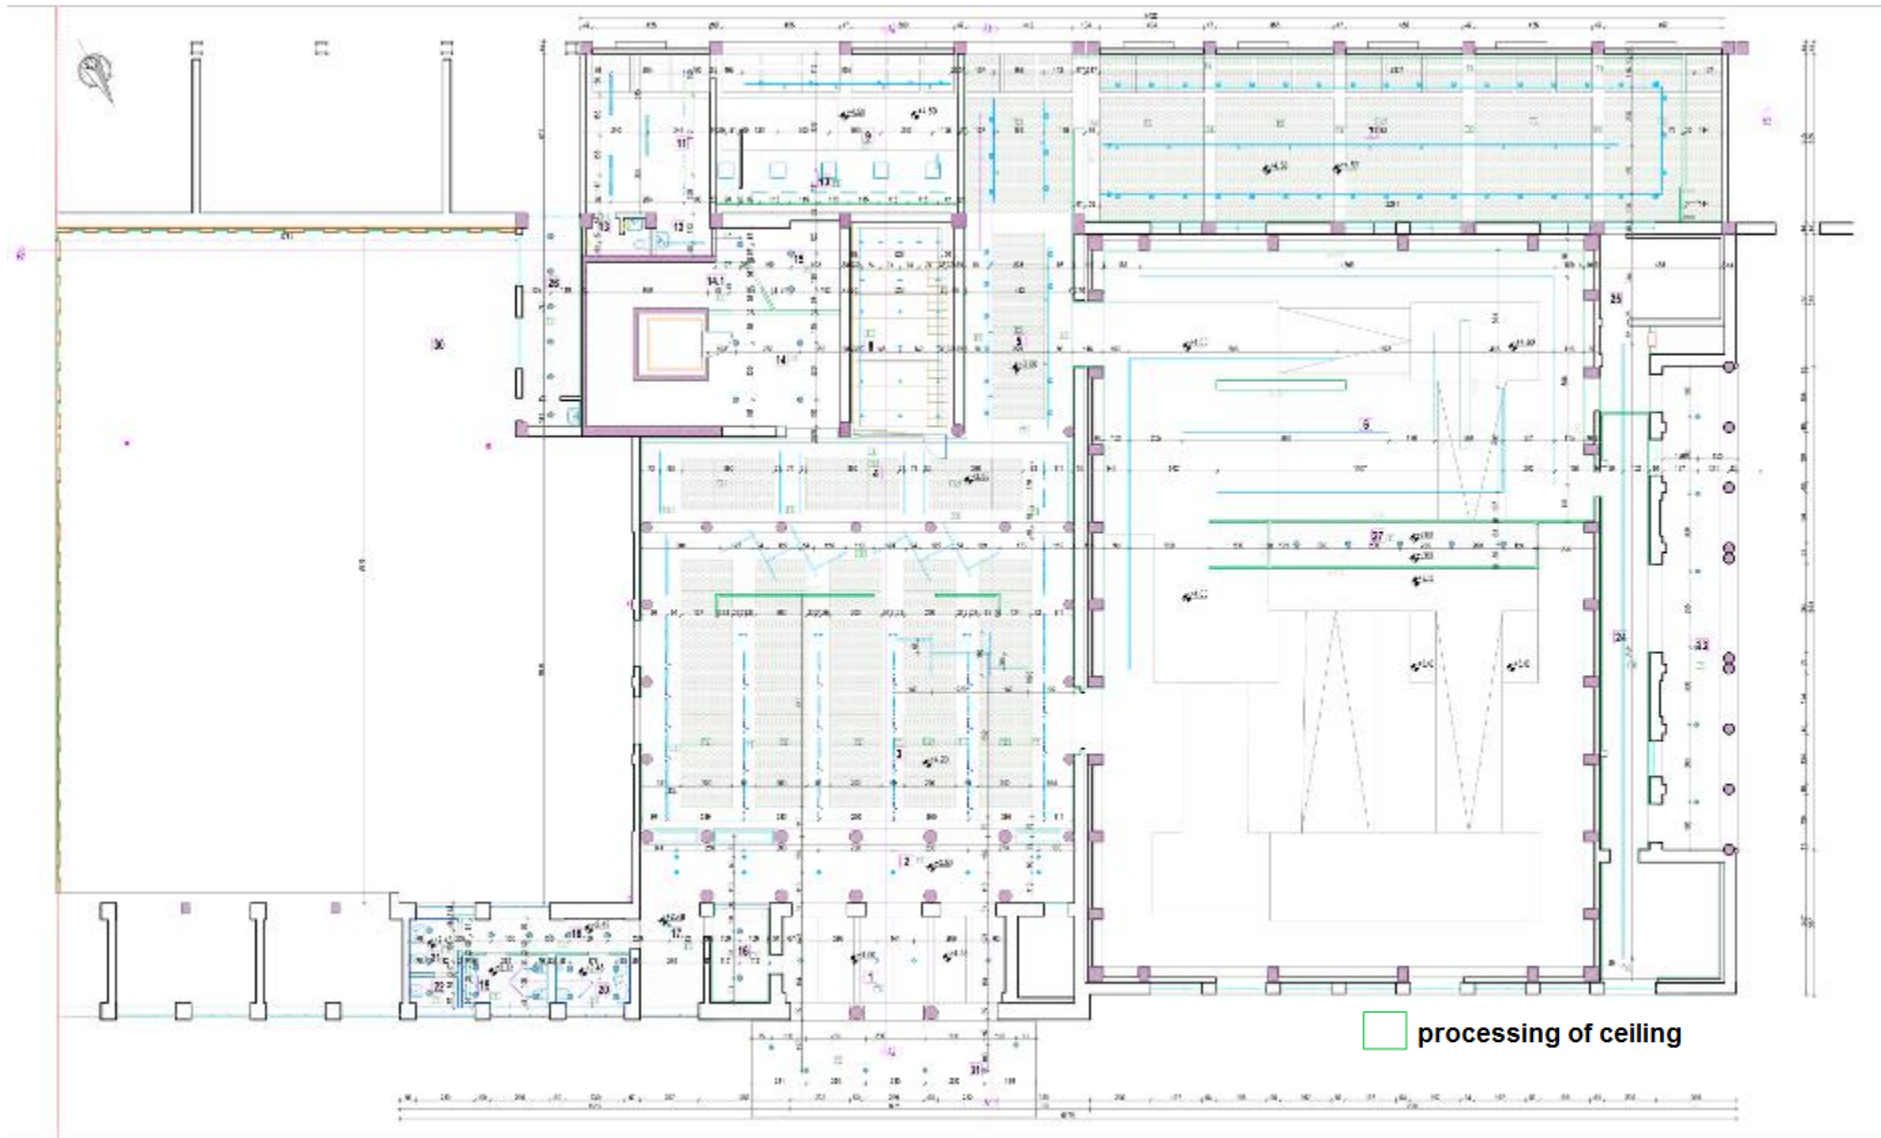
Base view of the ceiling of the ground floor (newly designed interior)
